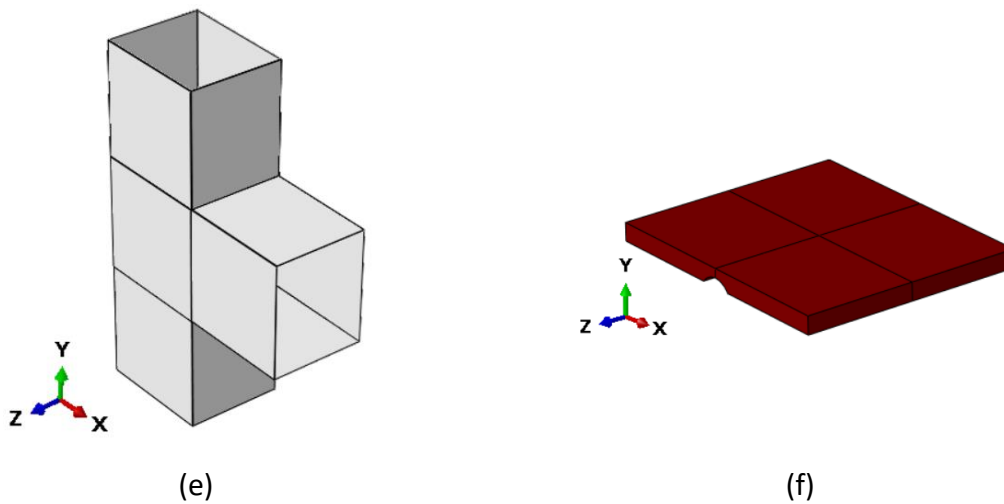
Components of the numerical model; (a) Epoxy adhesive; (b) U-shaped steel rebar; (c) concrete part; (d) steel reinforcements; (e) FRP sheet; (f) support plate (continue).
